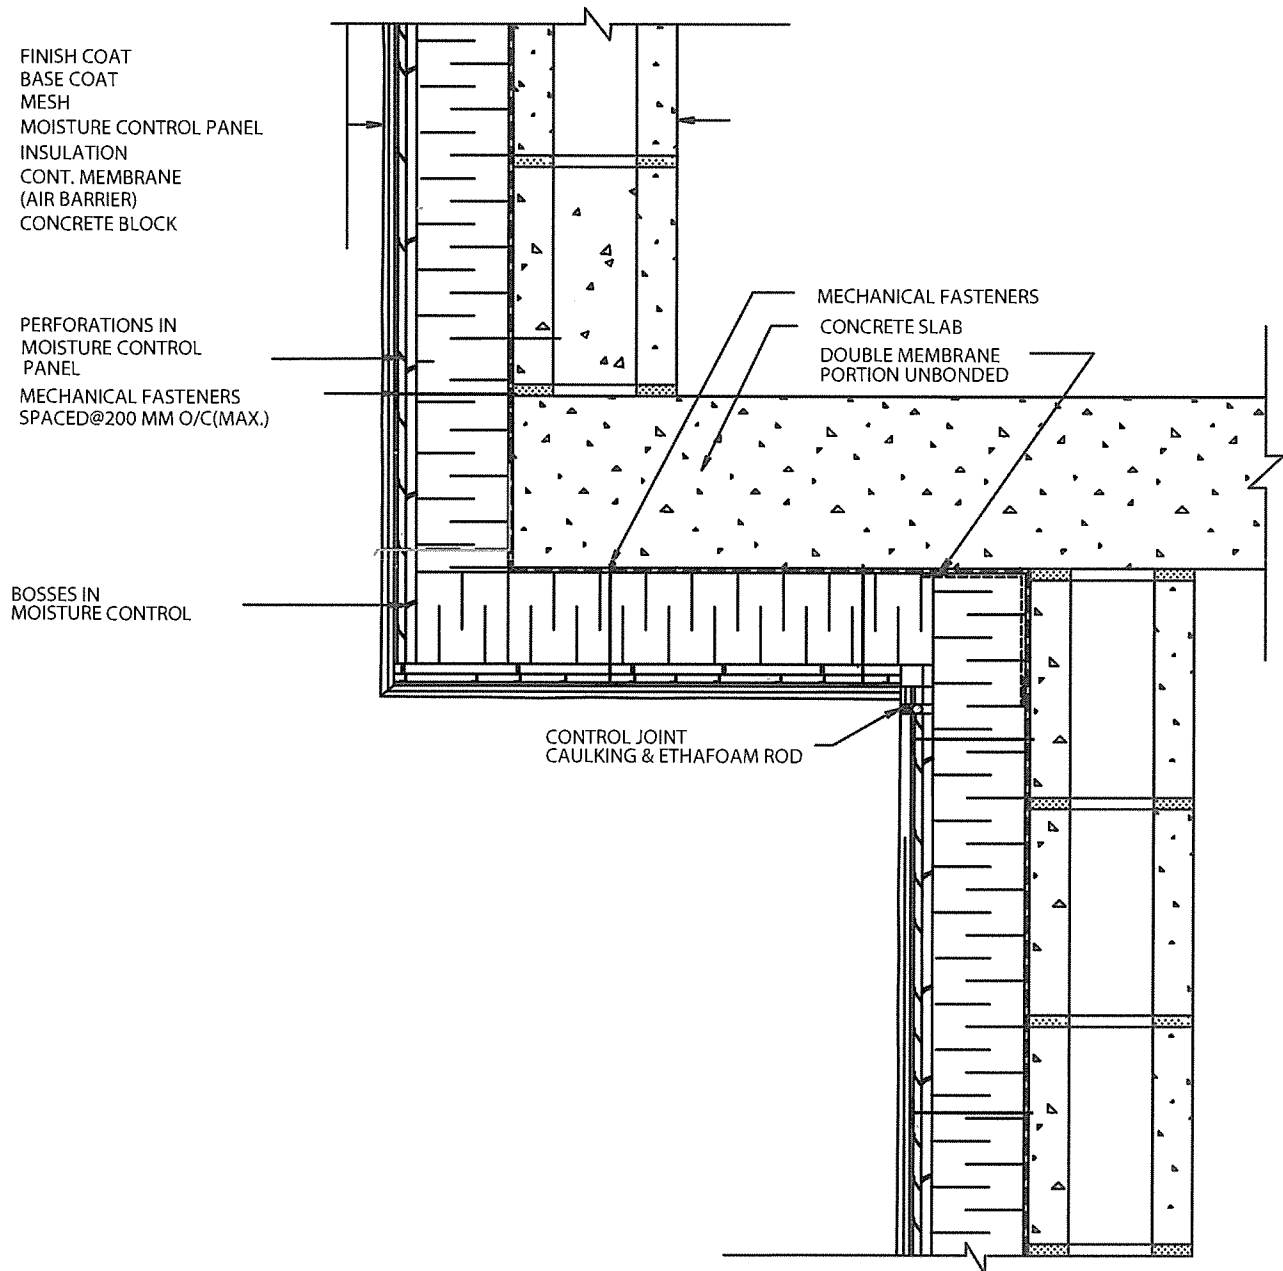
ACRYLIC STUCCO/CONCRETE BLOCK - CONTROL JOINT
